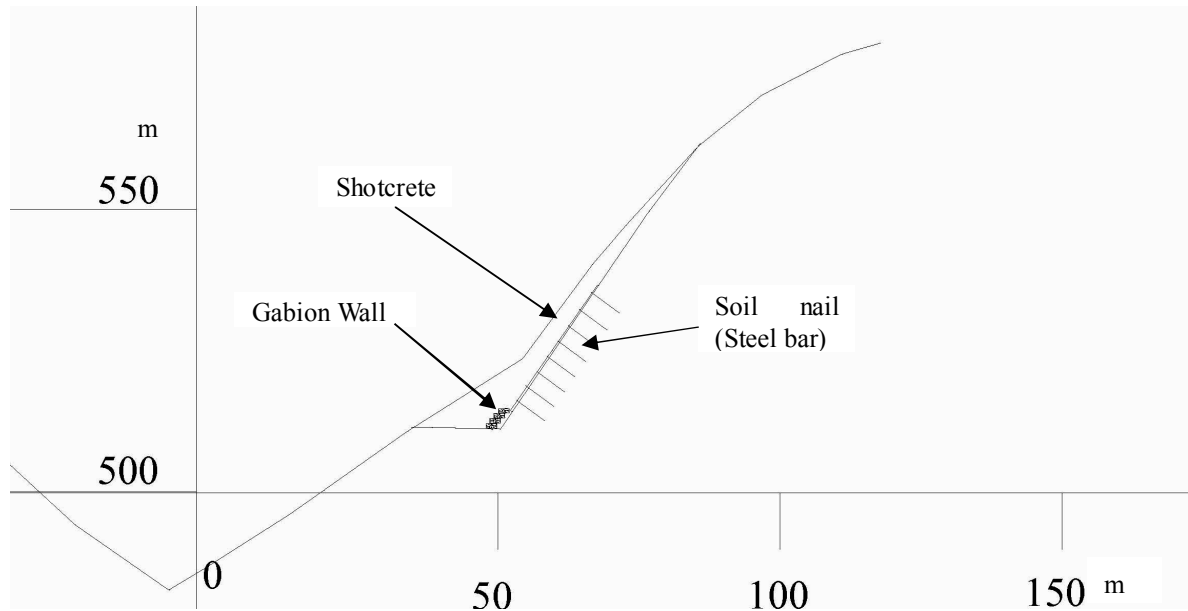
Example of Countermeasure against Slope Collapse
